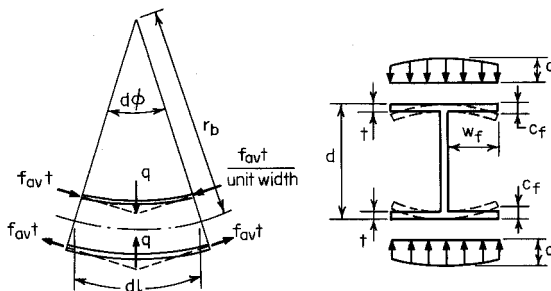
Flange curling of I-beam subject to bending.^{4.42}
